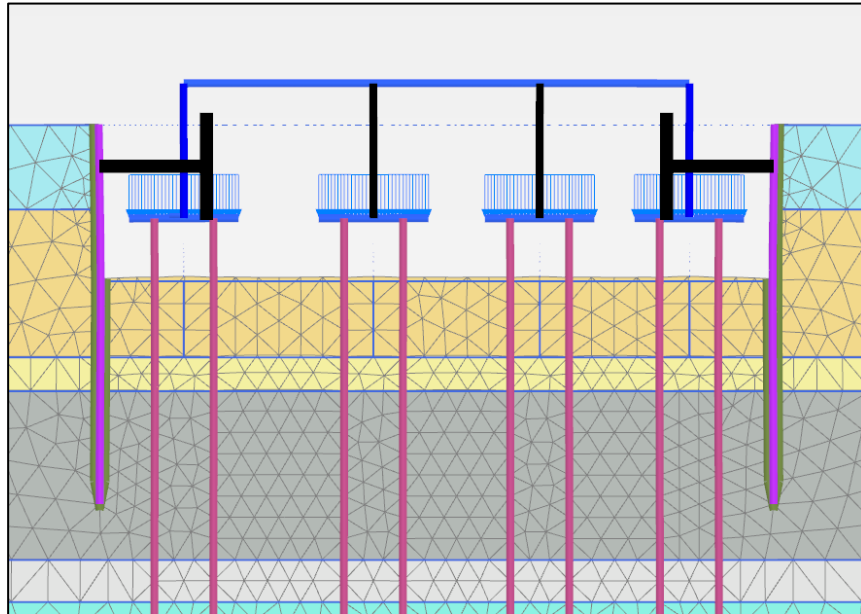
Excavation of soil under the footings in two steps. First step (Scale x20)
